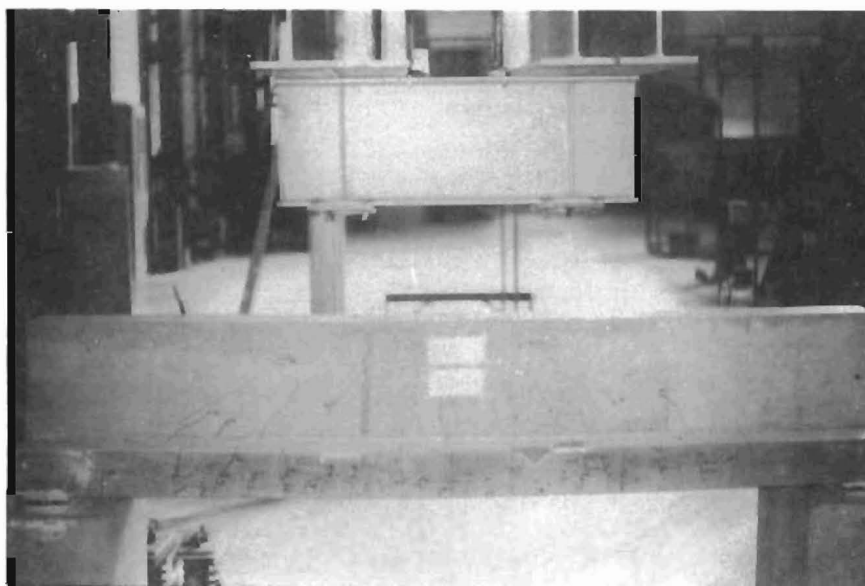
Cracking pattern and extent of cracking in specimen BMSPI
